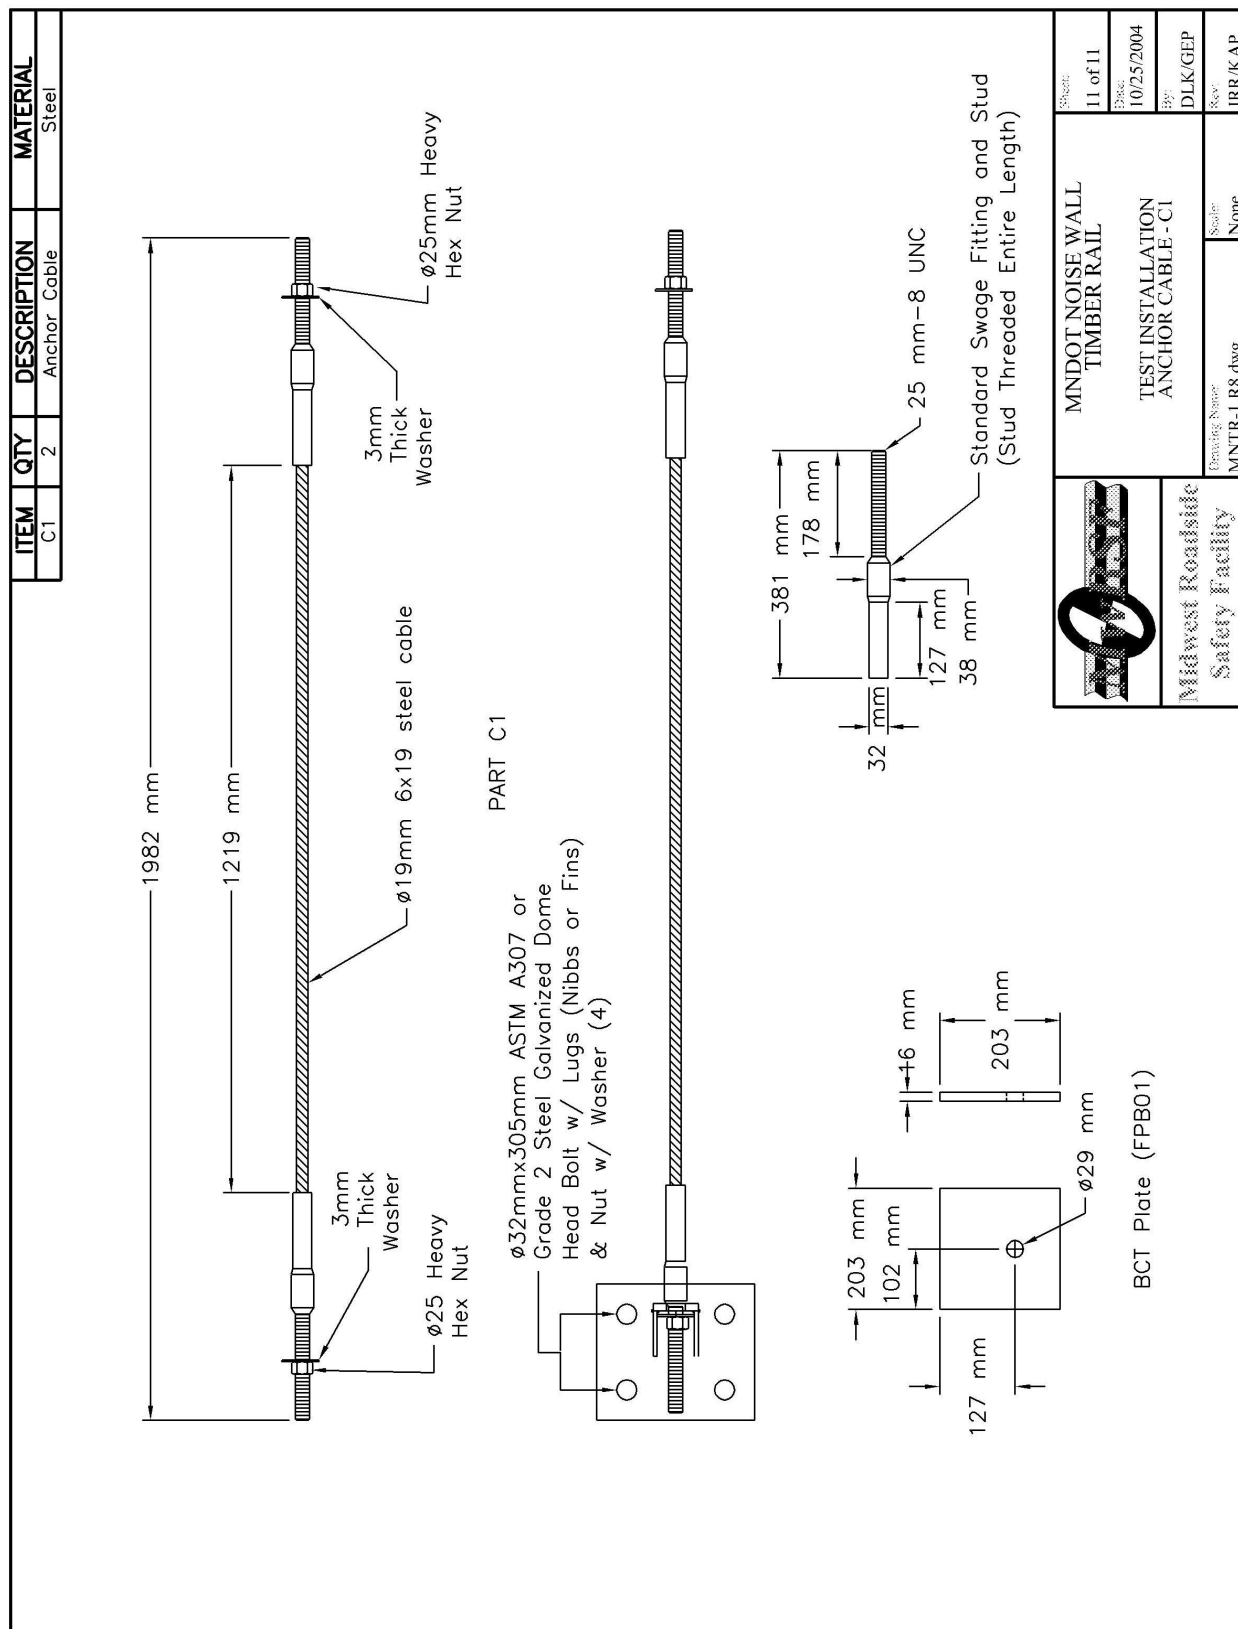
Mn/DOT's Timber Rub Rail Design Anchor Cable Details
